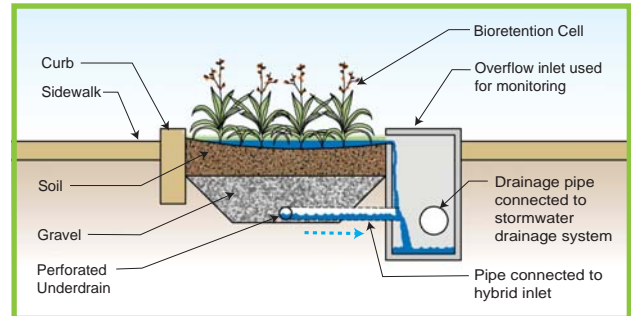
Conceptual Section of a Landscape Based Stormwater Management Facility in Sidewalk
